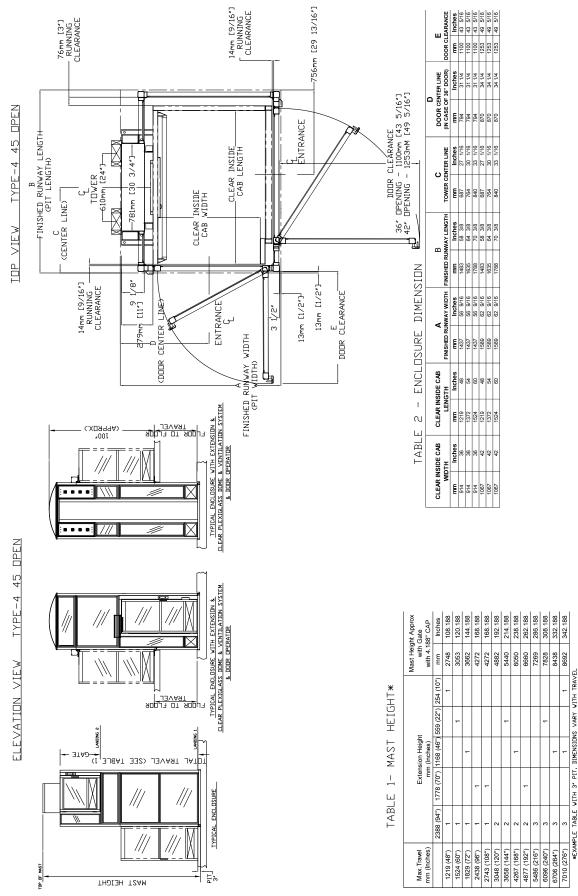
Elevation and plan view, enclosure application (Type 4, 45" opening)
